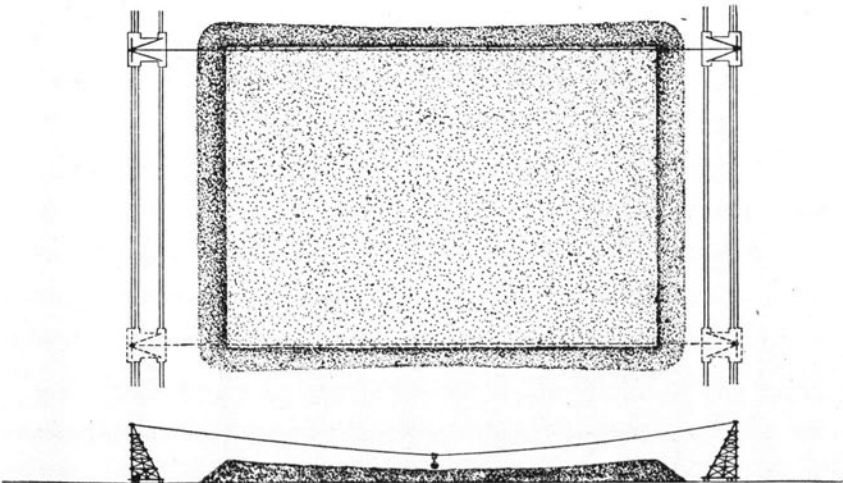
CABLEWAY SYSTEM FOR HANDLING COAL—BOTH END TOWERS MOVABLE
